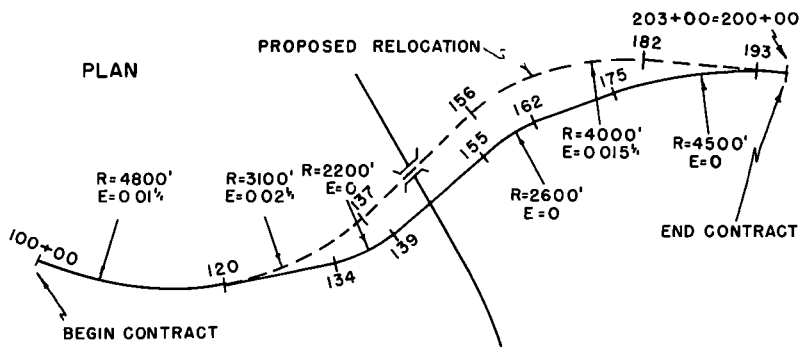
Plan of Sample Relocation Problem showing existing and proposed locations.
